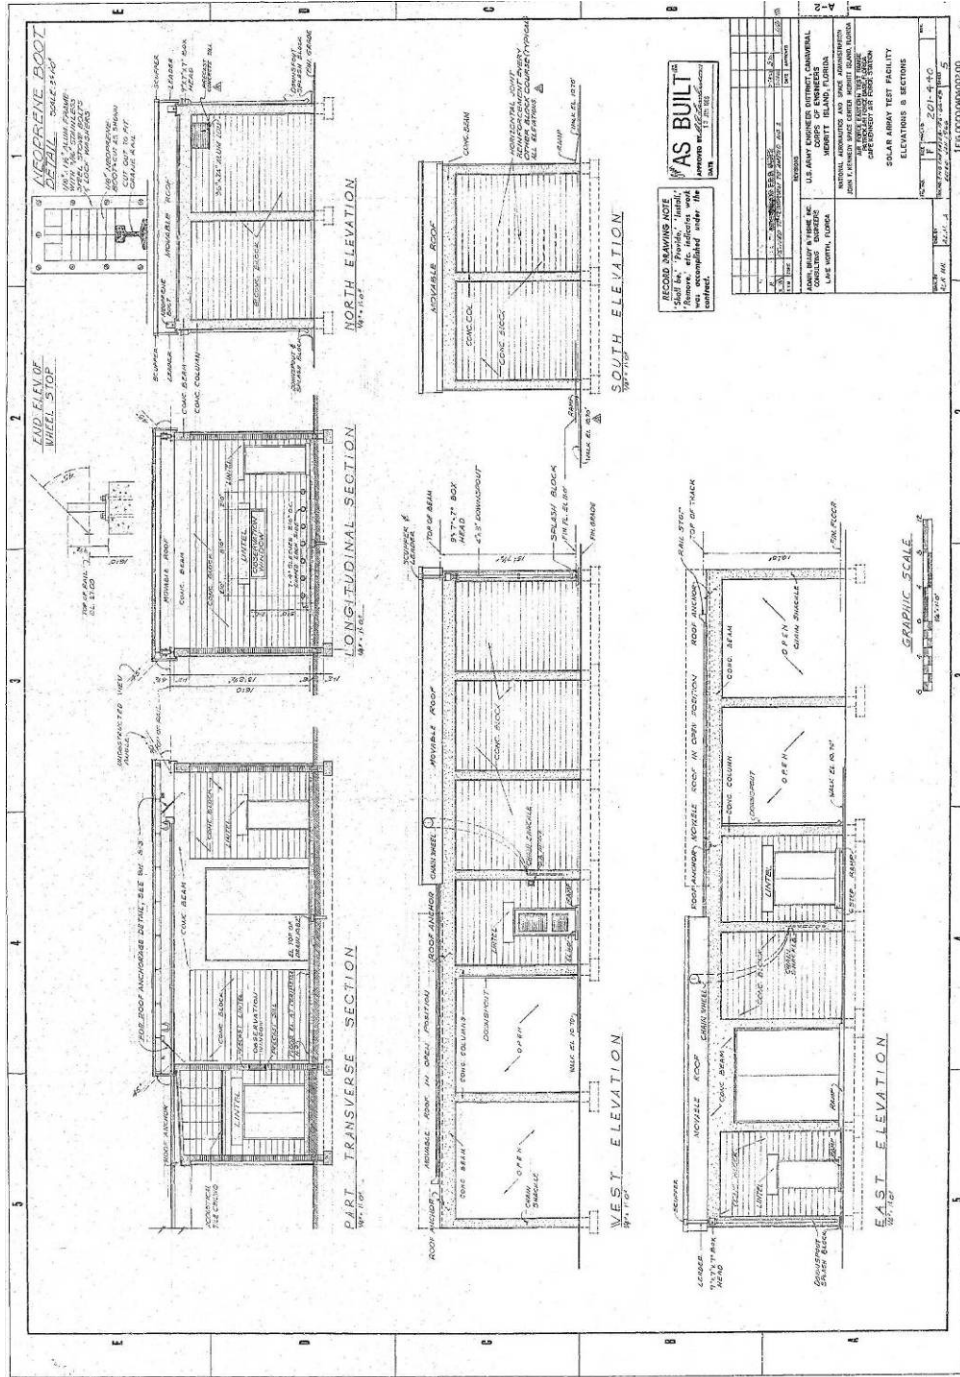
Adair, Brady & Fishe, Inc., Solar Array Test Facility, Elevations & Sections, January 1966, Sheet 5.
